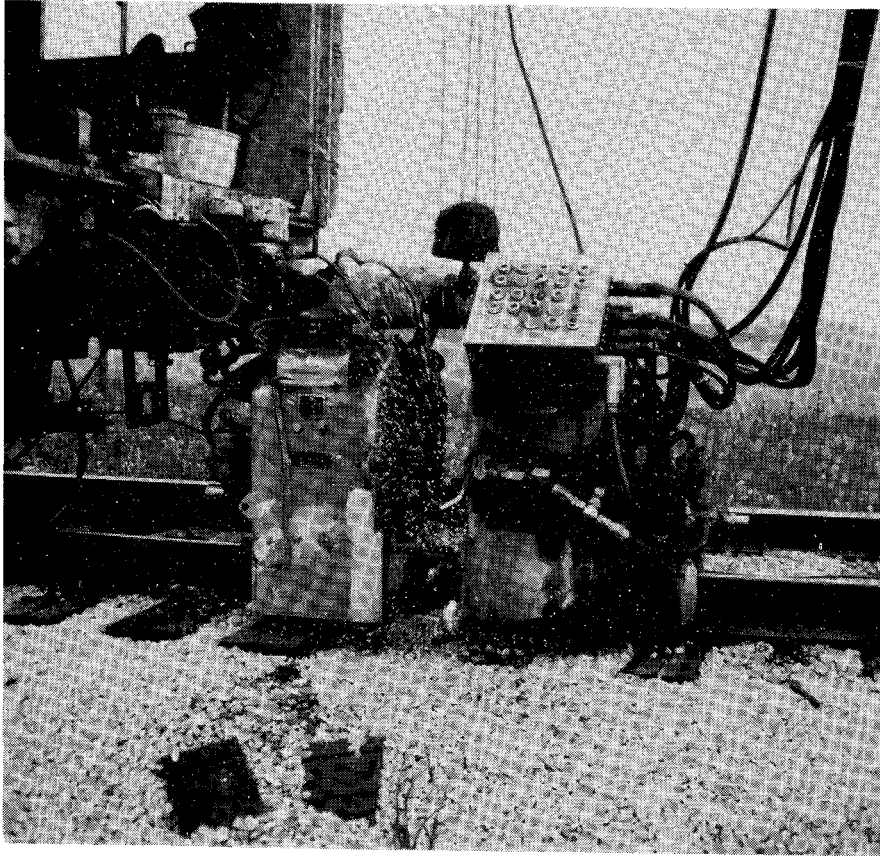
IN-TRACK FLASH WELDER DURING WELDING CYCLE
